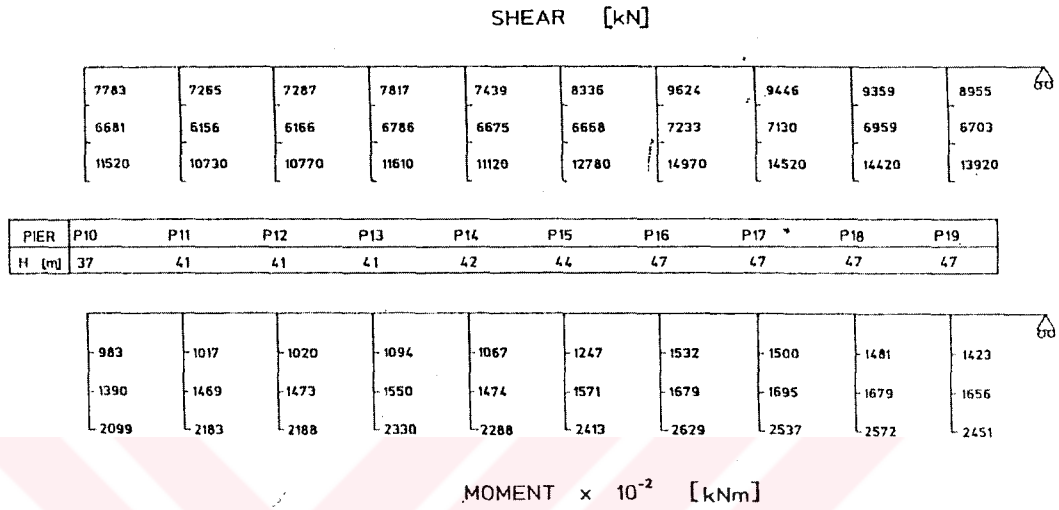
Pier Forces - Longitudinal Earthquake P10-P20 Section
